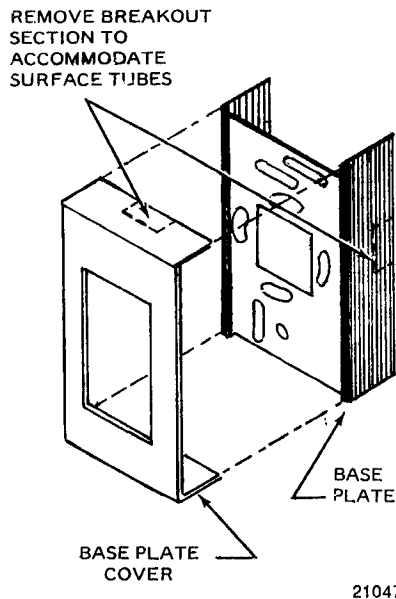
Breakout Sections for Surface Mounted Tubes.
